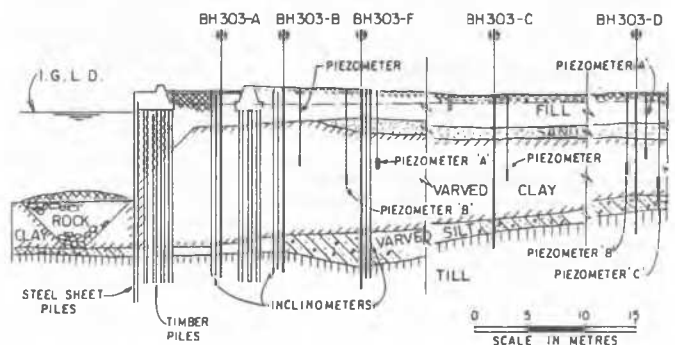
Test Load Section with Soil Profile and Instrumentation
